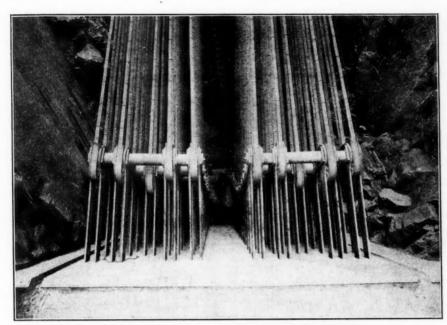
STRAND SHOES IN NEW JERSEY ANCHORAGE.
